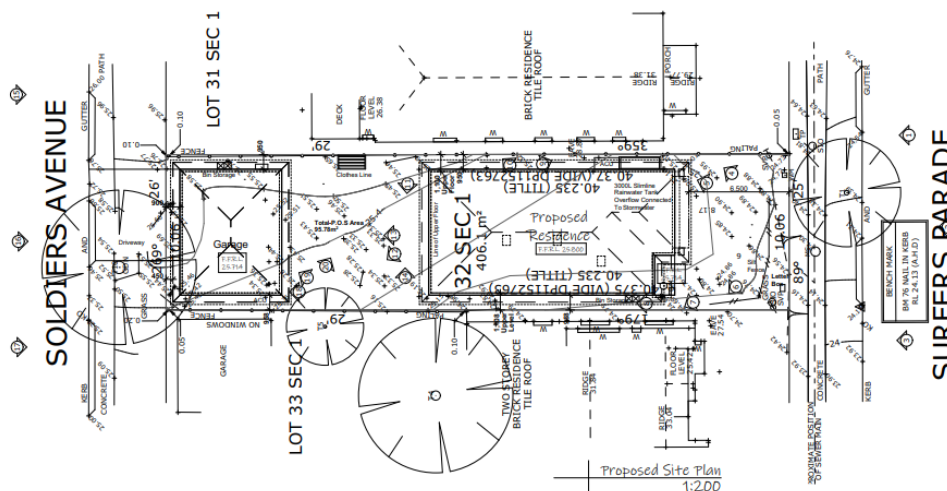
Extract from approved plans 6 Surfers Parade Freshwater (DA2021/0523)
